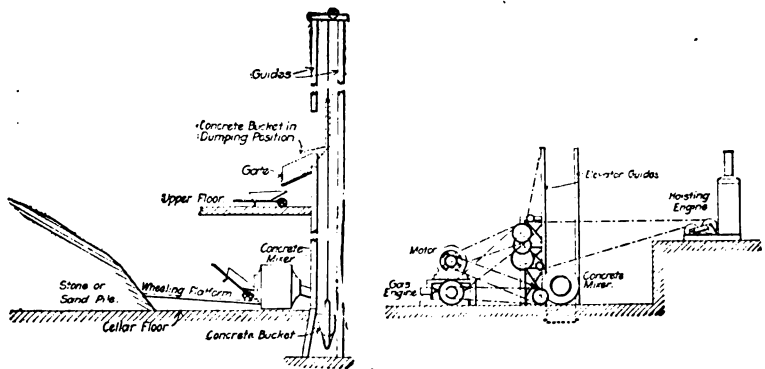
Concrete Mixing and Hoisting Plant, Ingalls Building, Cincinnati, Ohio.
